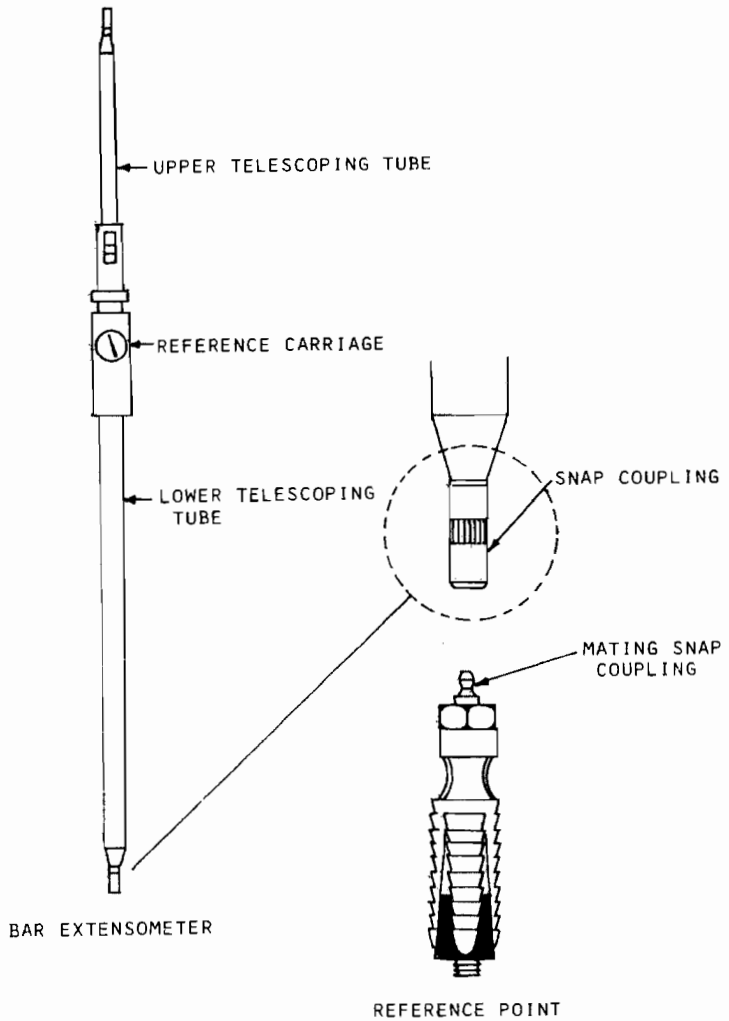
BAR EXTENSOMETER AND TYPICAL REFERENCE POINT.
